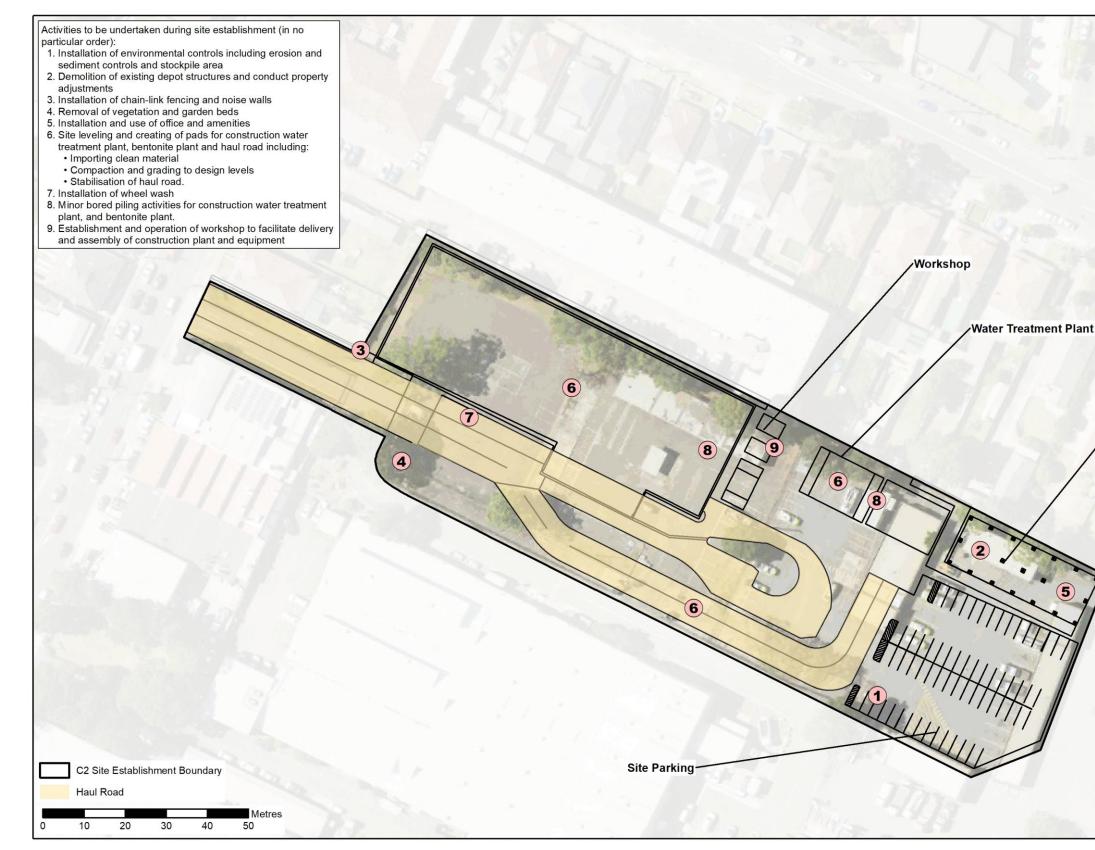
Stage 1 Preliminary construction activities at C2 Rockdale Depot construction ancillary facility
